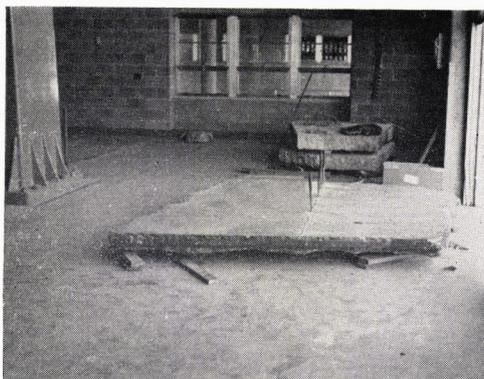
Large slab of old concrete being split in half preparatory to sawing 16- by 40-inch test specimens.
